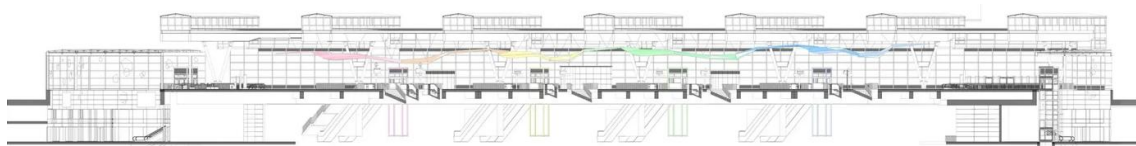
Elevation of the renovation project of Berlin-Südkreuz Station
